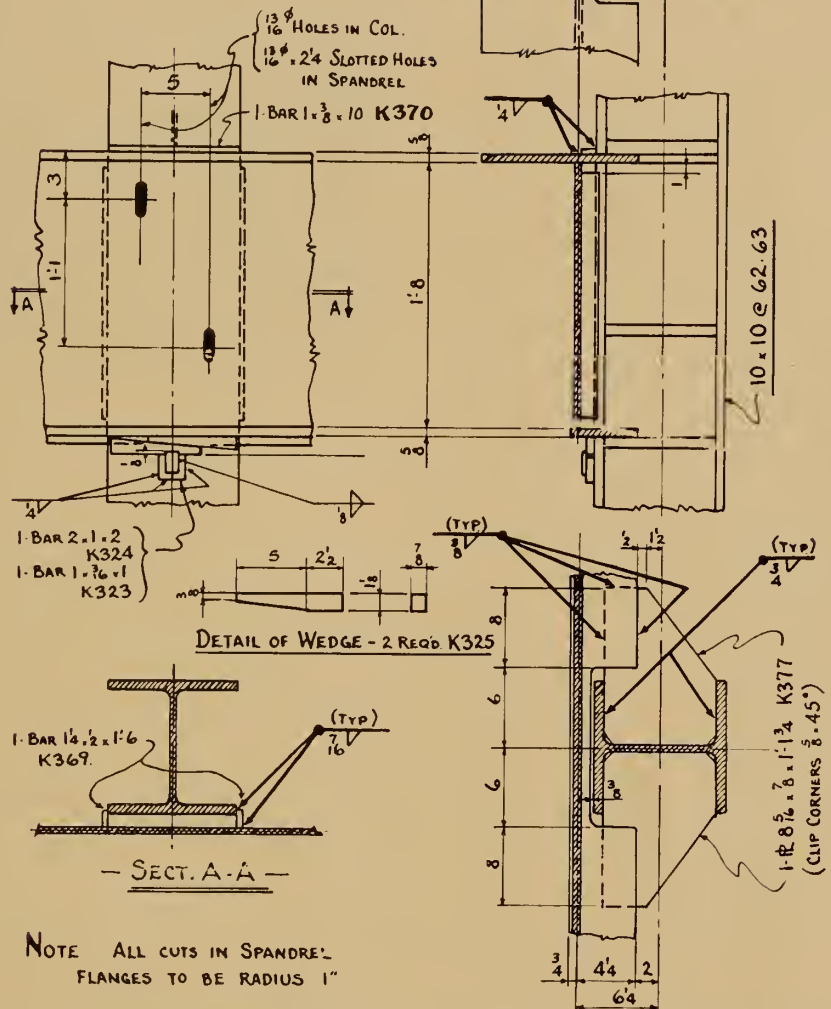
Standard sheet for a typical spandrel beam to column connection.
